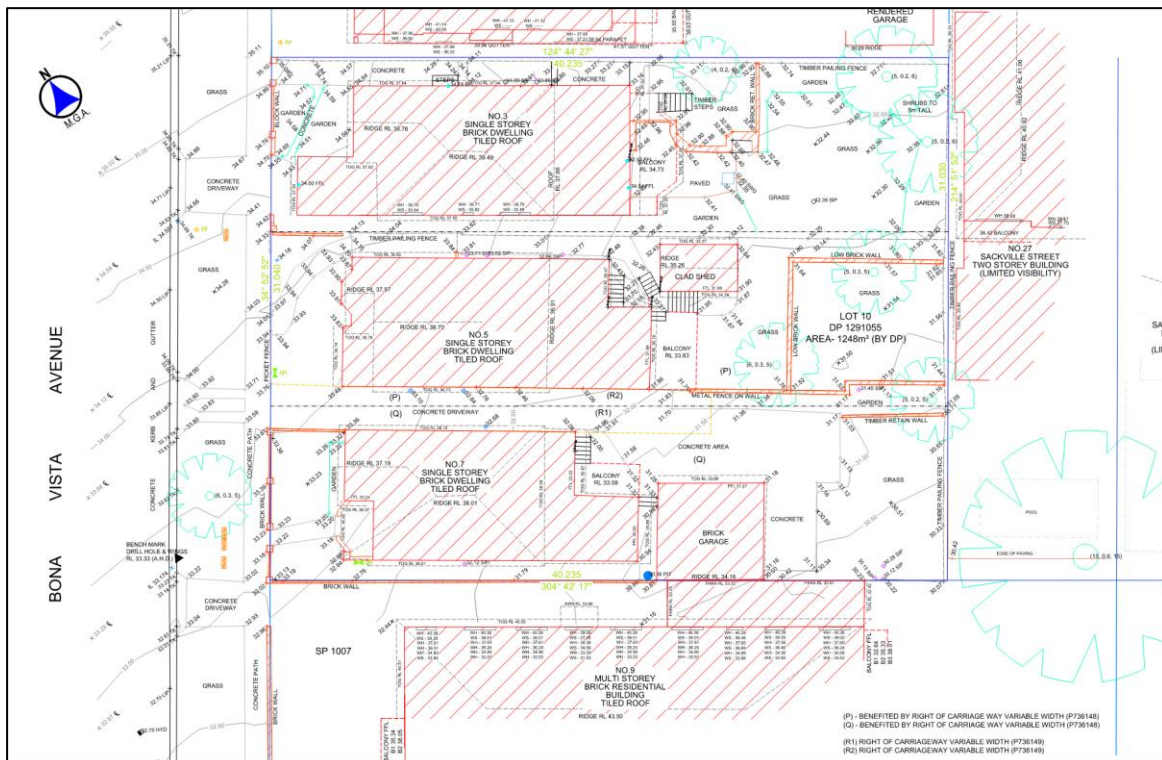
Survey Plan for 3-7 Bona Vista Avenue, Maroubra (Source: Survade)
